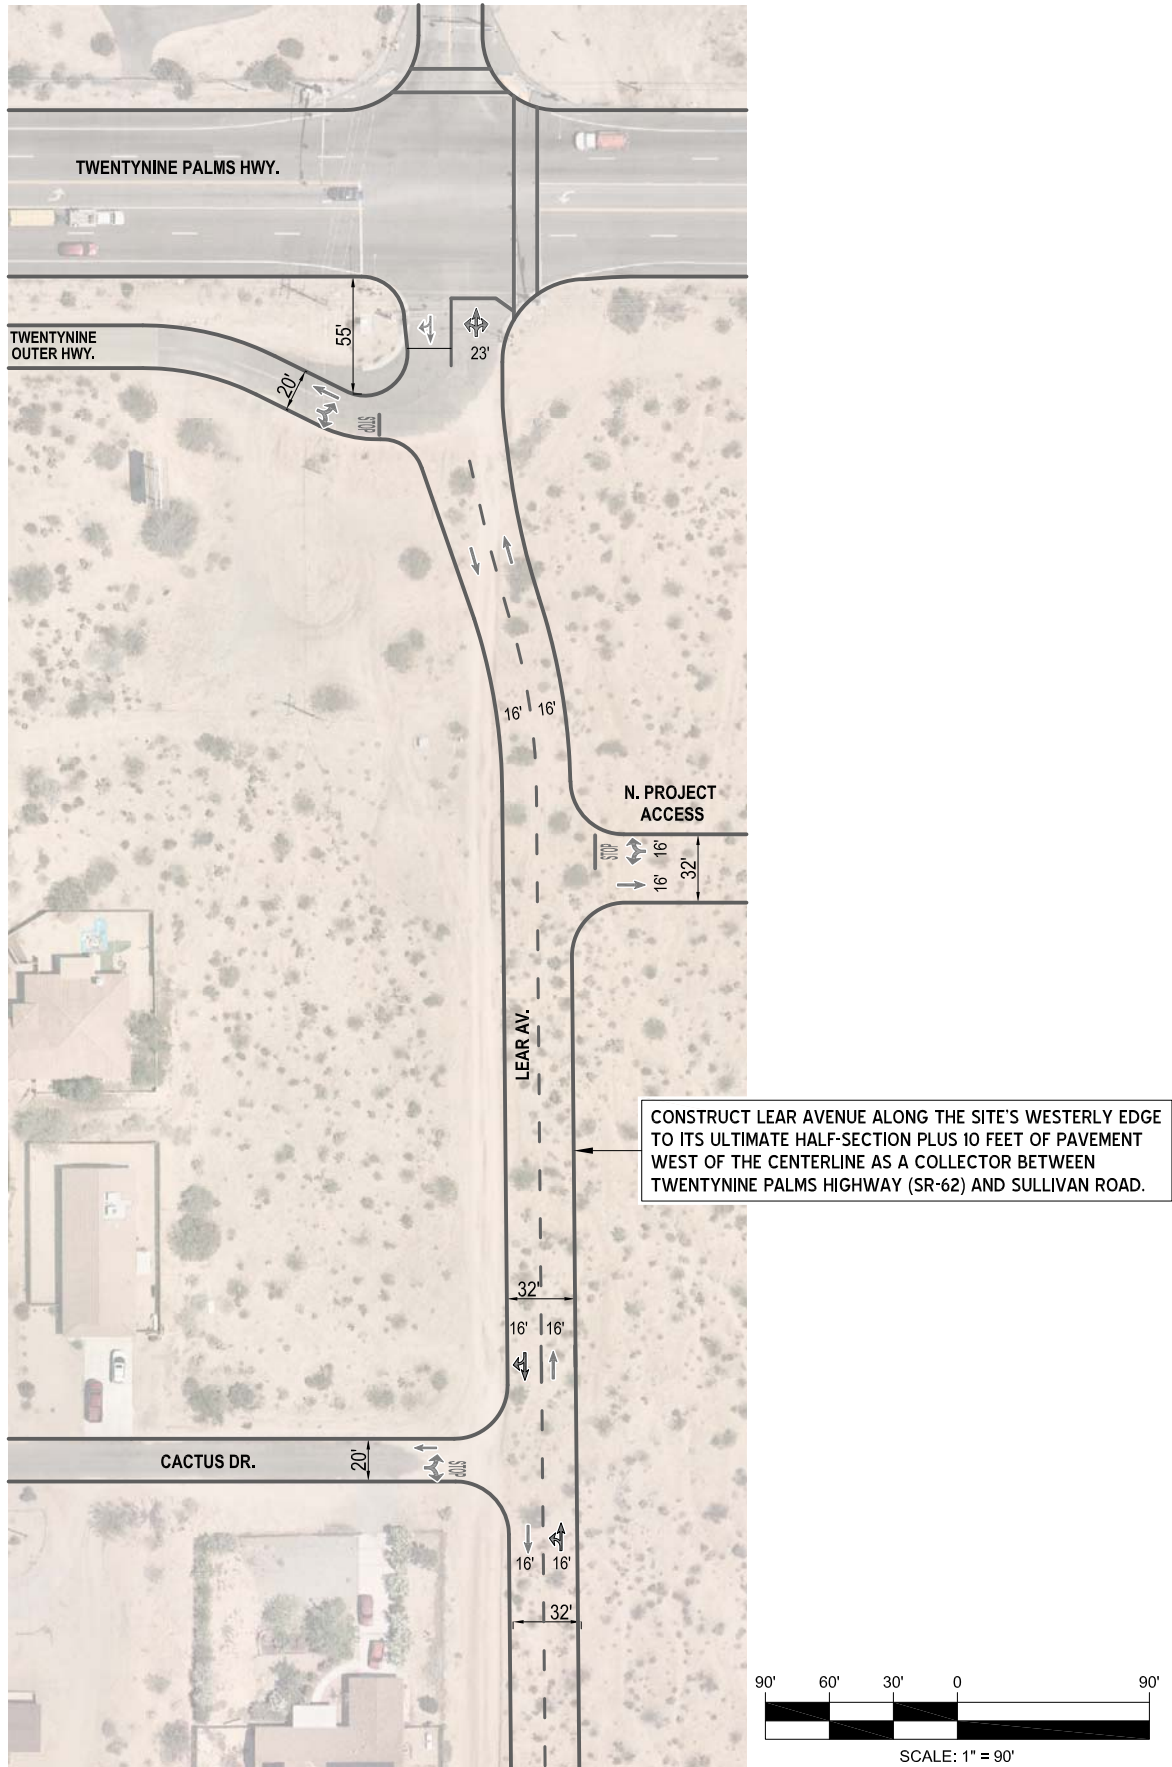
LEAR AVENUE AND N. PROJECT ACCESS CONCEPT STRIPING PLAN
